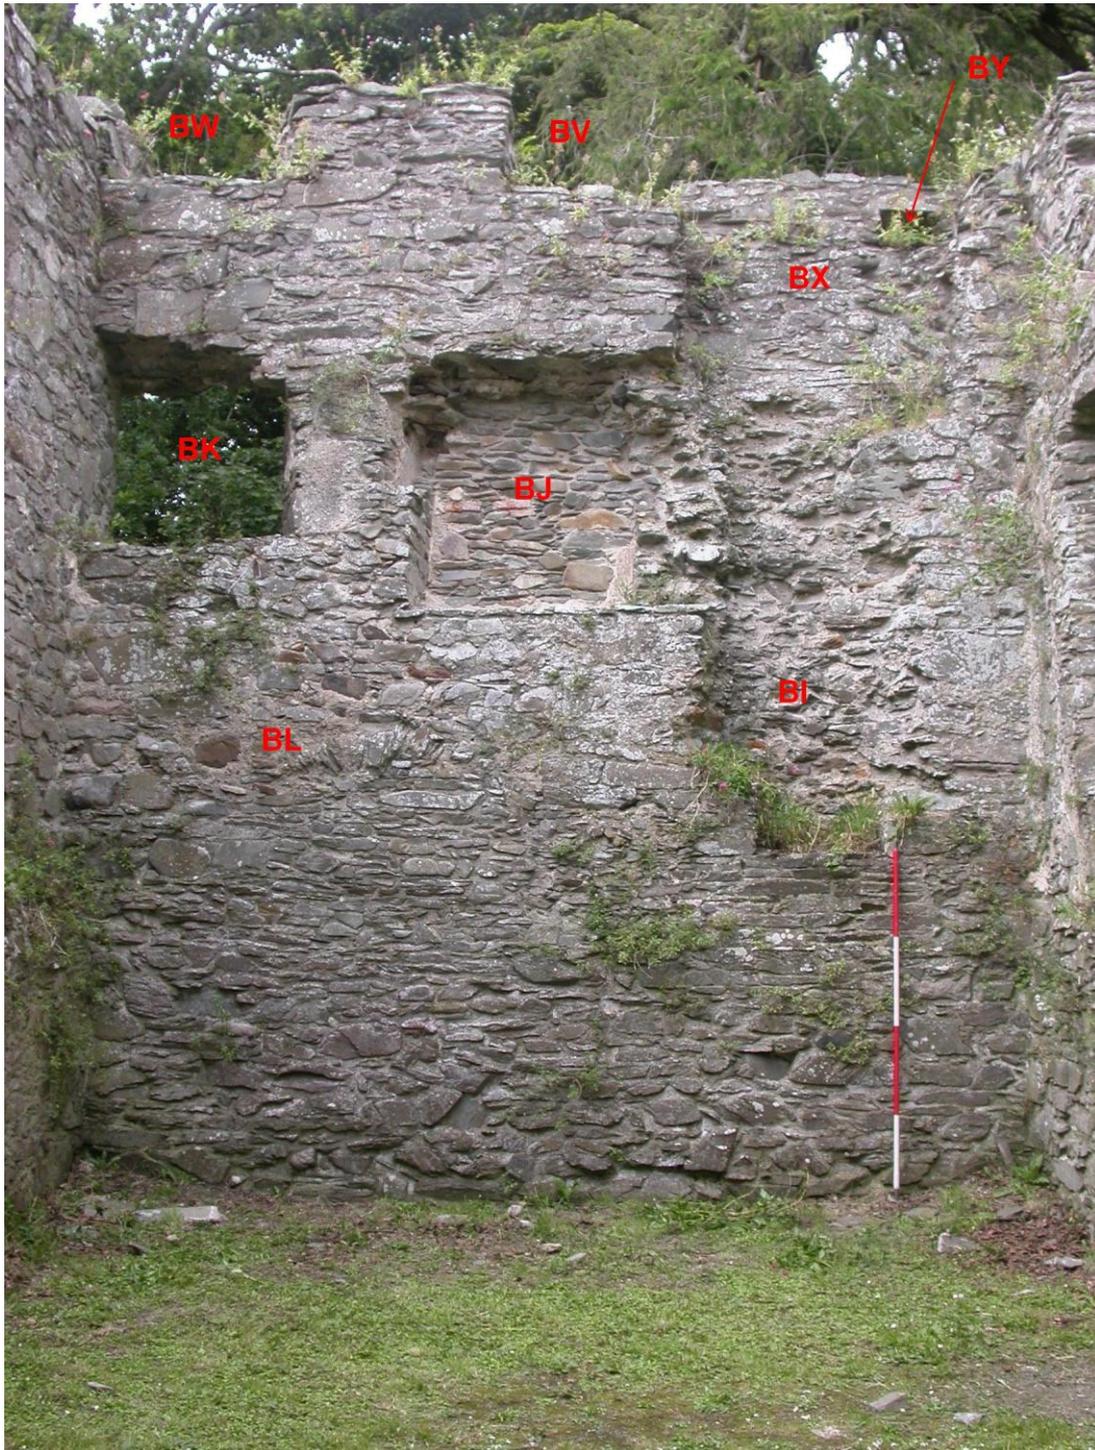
Inner-face of the north wall of the east wing, looking north. Scale 2.0 metres.
